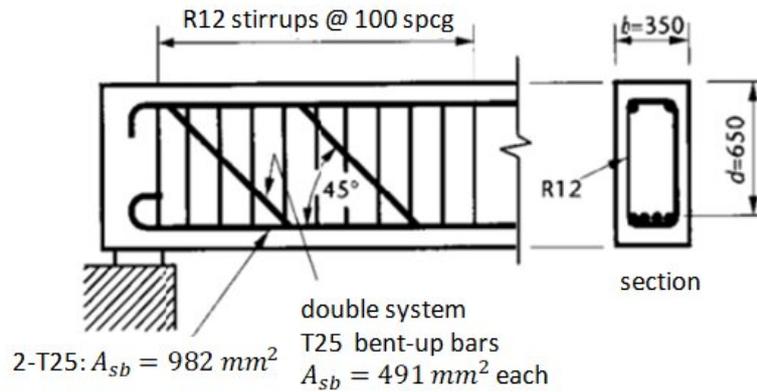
Beam with Stirrups and Bent-Up Bars
